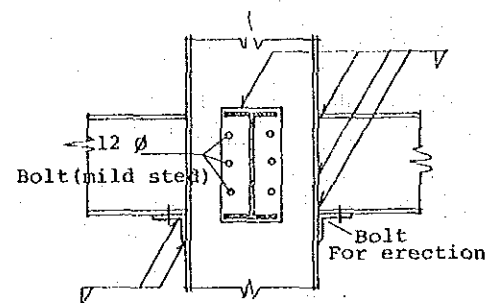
TYPICAL CONNECTION OF EXTERNAL COLUMN AND BEAM
